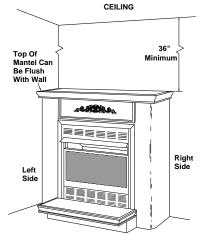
Mounting Clearances As Viewed From Front of Fireplace Shown with Optional Mantel
